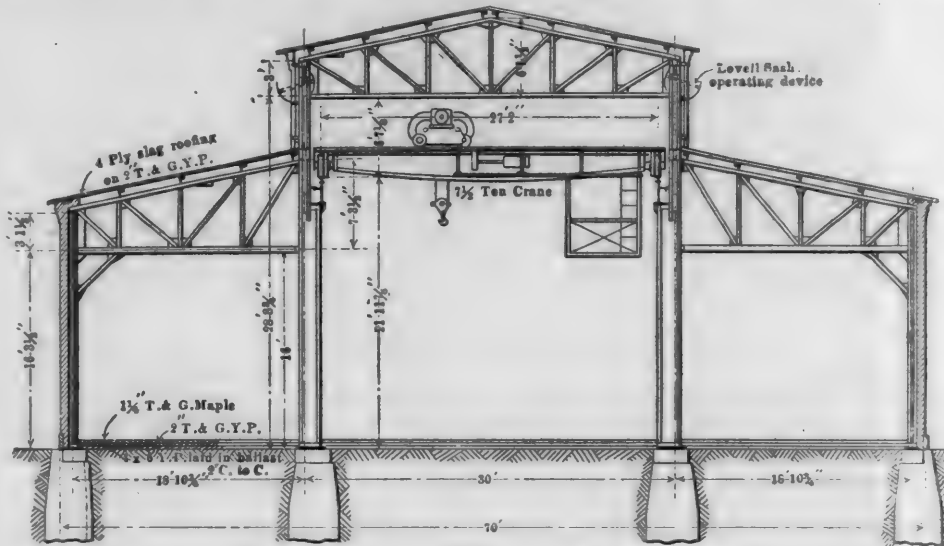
CROSS-SECTION THROUGH MACHINE SHOP.
